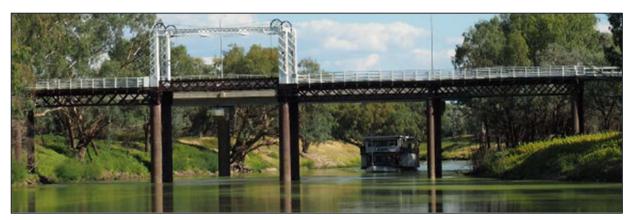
General view of the North Bourke Bridge, looking south. Source: Focus Bridge Engineering (FBE), 2024
